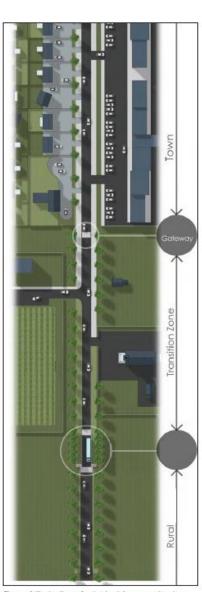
Illustration of a typical inner and outer Gateways, and Transition Zone from a rural road to a town/village.
